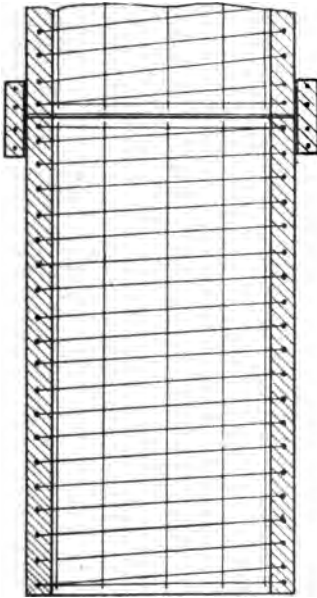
Longitudinal Section of Water Pipe with Sleeve Connection.
